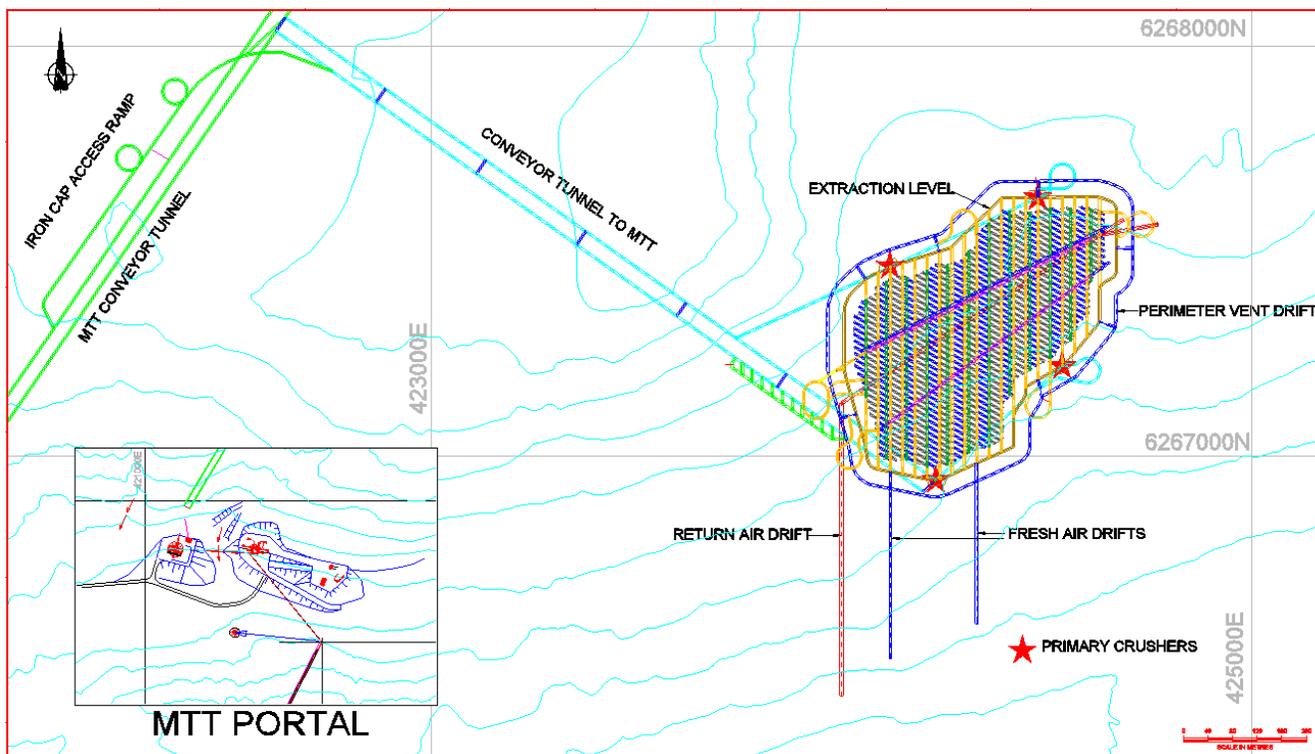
Plan view of the proposed Iron Cap underground mine layout
